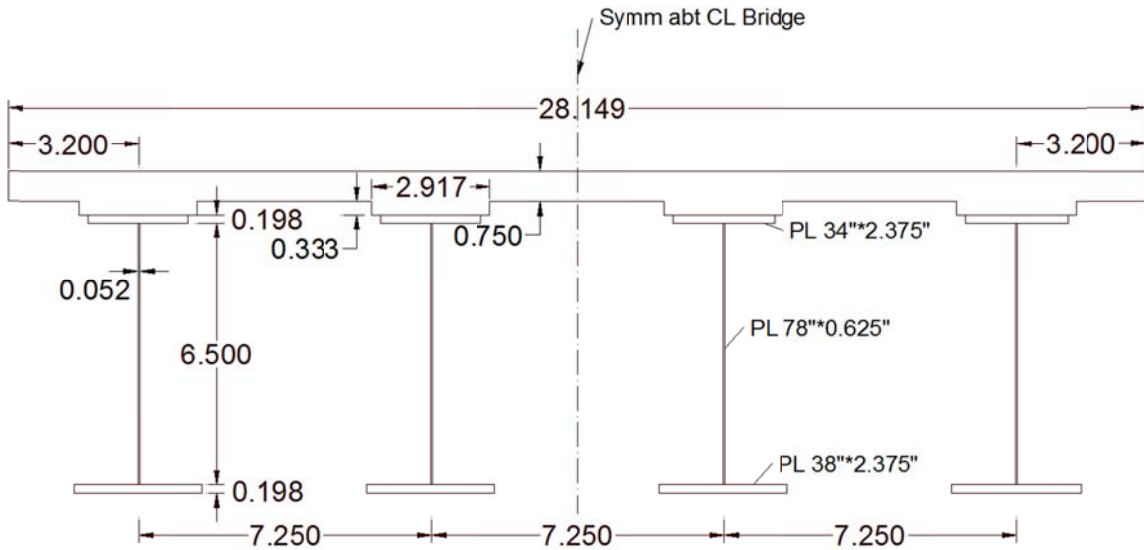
Typical steel I cross section (2) for L = 180ft at pier location
